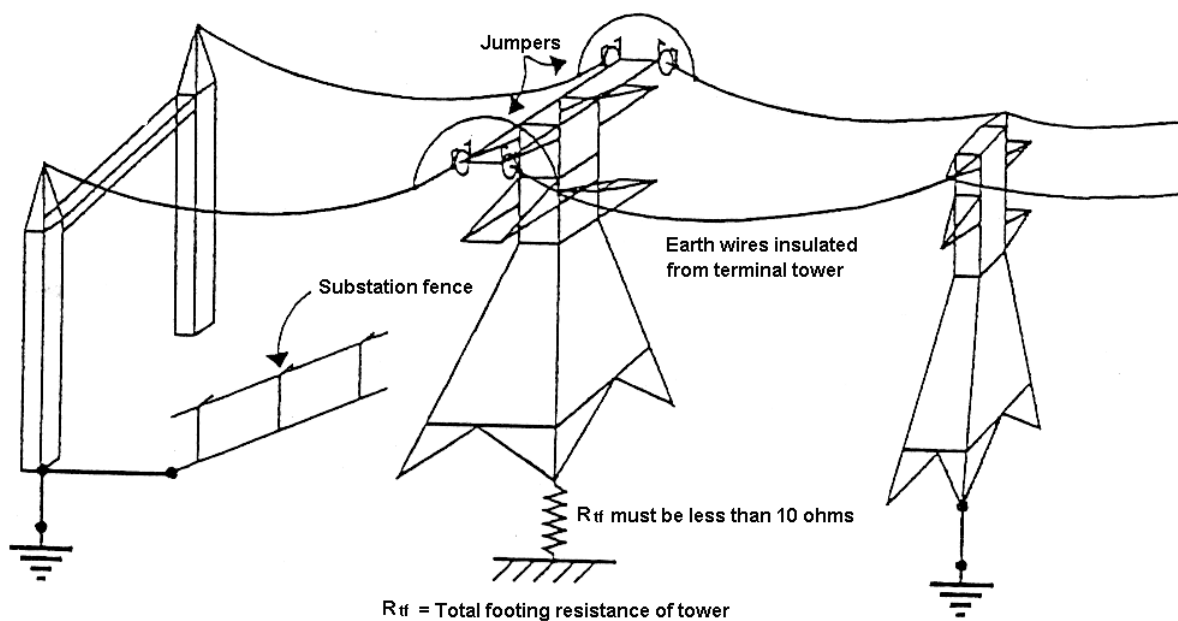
Insulation of earth conductors where terminal tower cannot be connected to substation main earth
